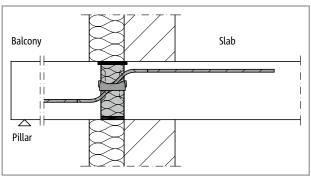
Schöck Isokorb® T type Q-E: Connection for exterior insulation
